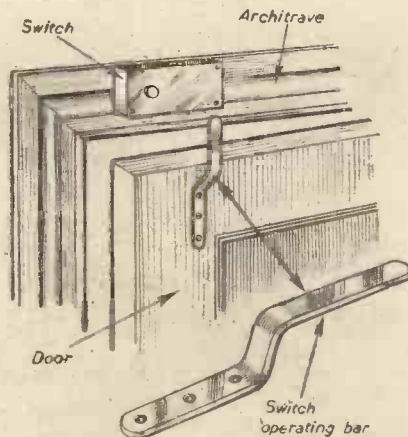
Mounting the switch and its operating bar. The whole assembly can be neat and unobtrusive.
